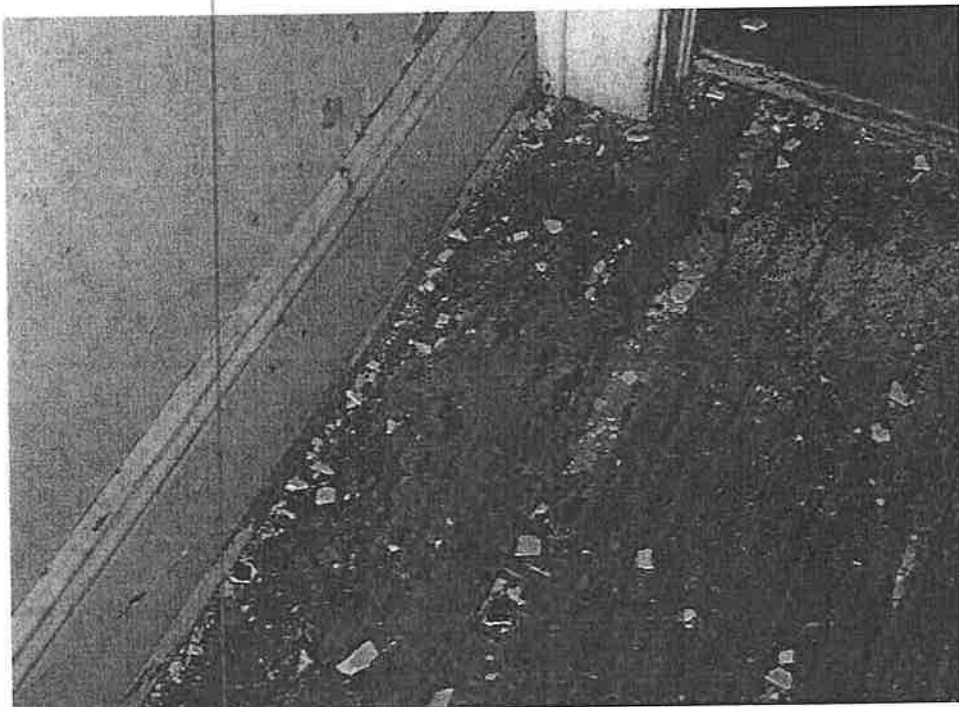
Moisture damaged flooring with soft subflooring at 2nd Floor.
